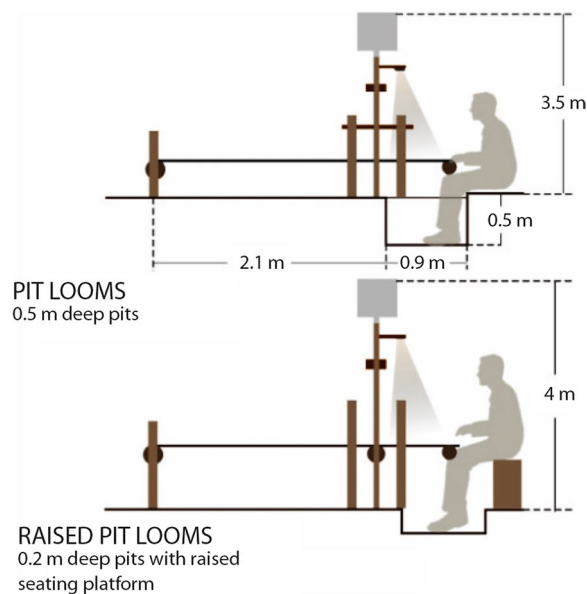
Spatial requirement for pit-looms and raised pit-looms (Source: the author)
